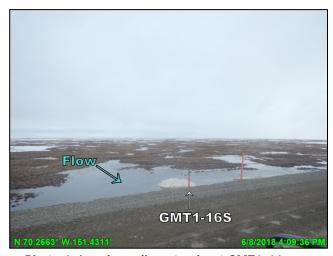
Local ponding at culvert GMT1-16 on south side of GMT1 access road, looking south; June 8, 2018
